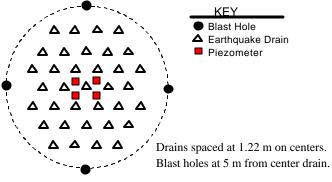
Layout of Earthquake Drains, blast charges, and piezometers for Vancouver, BC drain test.
